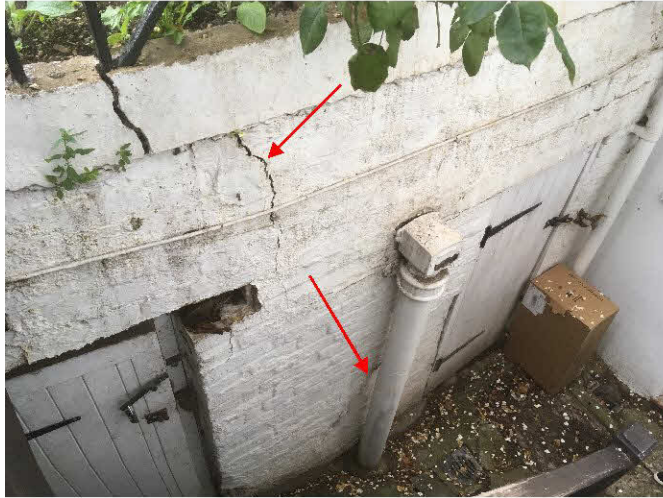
From top of steps. Note missing lintel on LH door, crack through brickwork and capping stone above door
